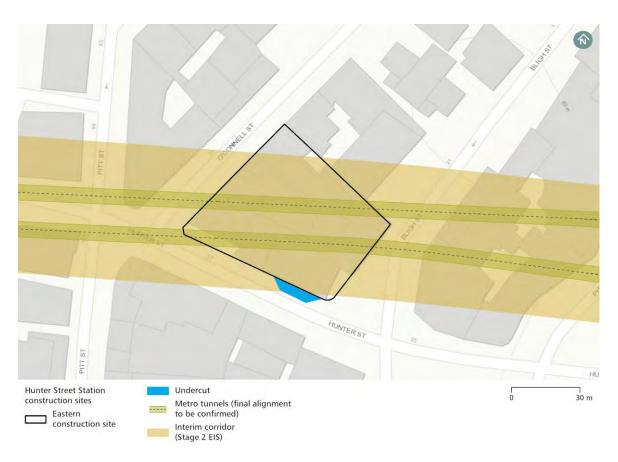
Proposed change to Hunter Street eastern construction site (Source: Sydney Metro)
